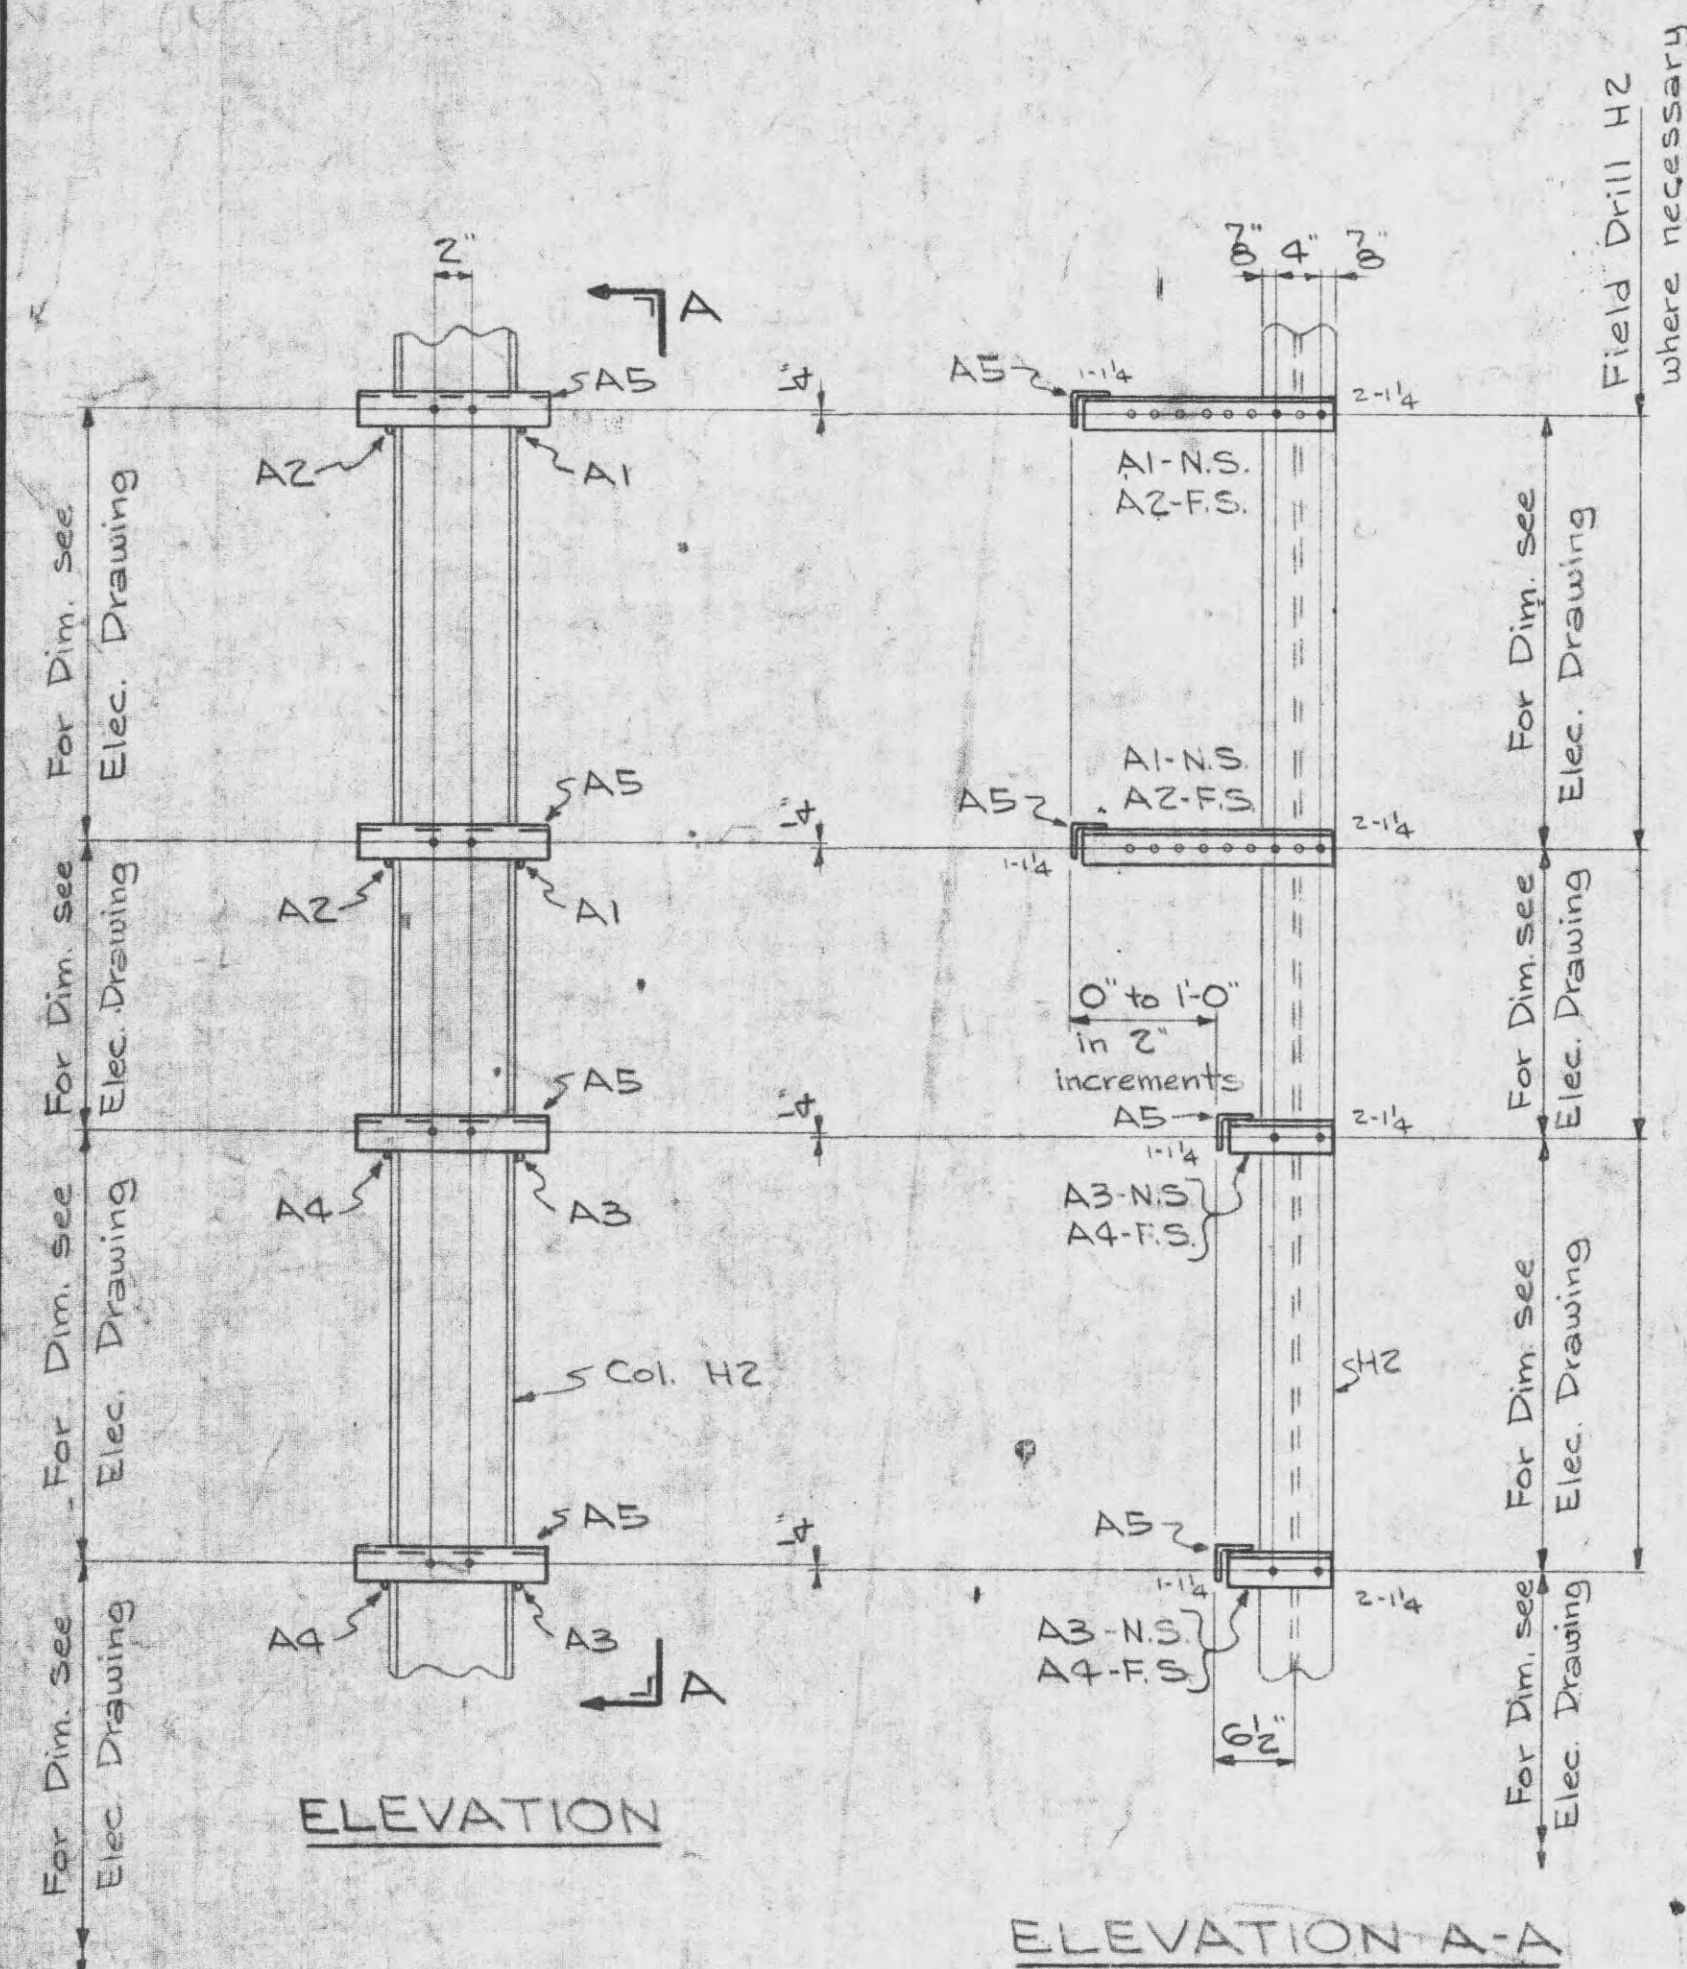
KV Bus and Switch Structure-LC-17523(Strain Bus)
